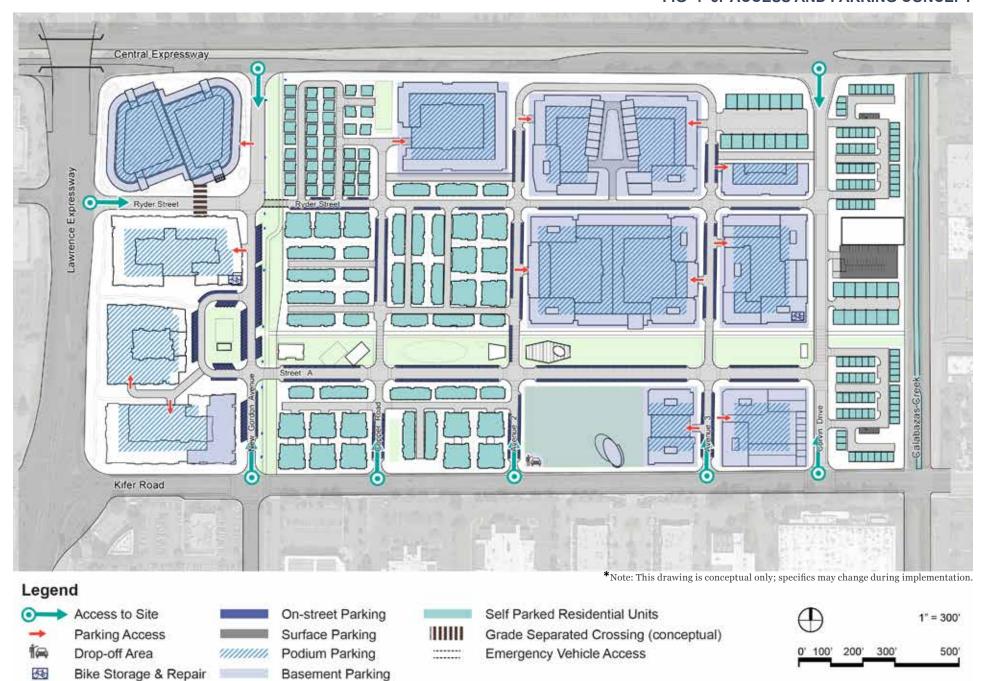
depicts a conceptual plan for the location of parking facilities, including parking garages (podium parking and basement parking), on-street parking, and surface parking. Parking facilities will be distributed separately within each development parcel, primarily accessed via the local collector roadways and private driveways to ensure that interior streets remain pedestrian-oriented. On-street parking will also be available along some local streets, especially along mixed-use sites, where it will help meet short-term parking needs and serve ground level retail; however, on-street parking shall not count toward meeting parking requirements. Residential parcels will utilize structured parking and/or one level of below-podium parking for the purpose of encouraging active uses along street frontages.
